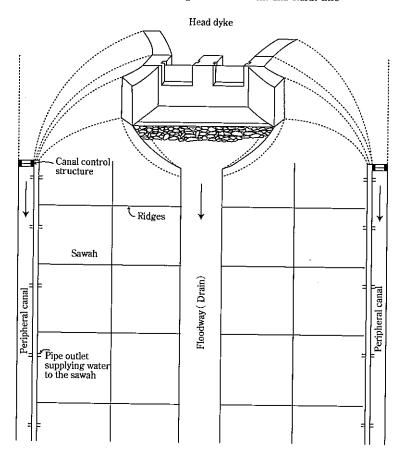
Typical layout of a water control system by head dyke(Savvides 1981)
